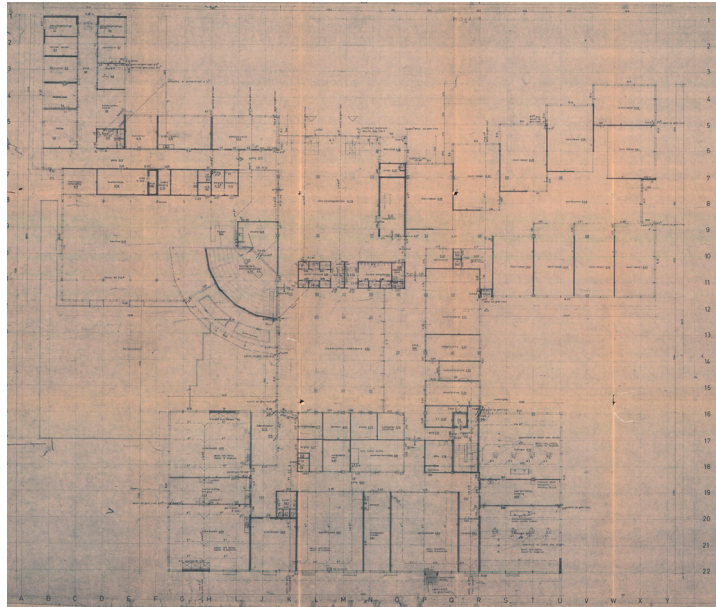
Floor plan Building 2. (Source: Bouwarchief Amsterdam Nieuw-West, J.B. Ingwensen Architect B.N.A., 1974)
